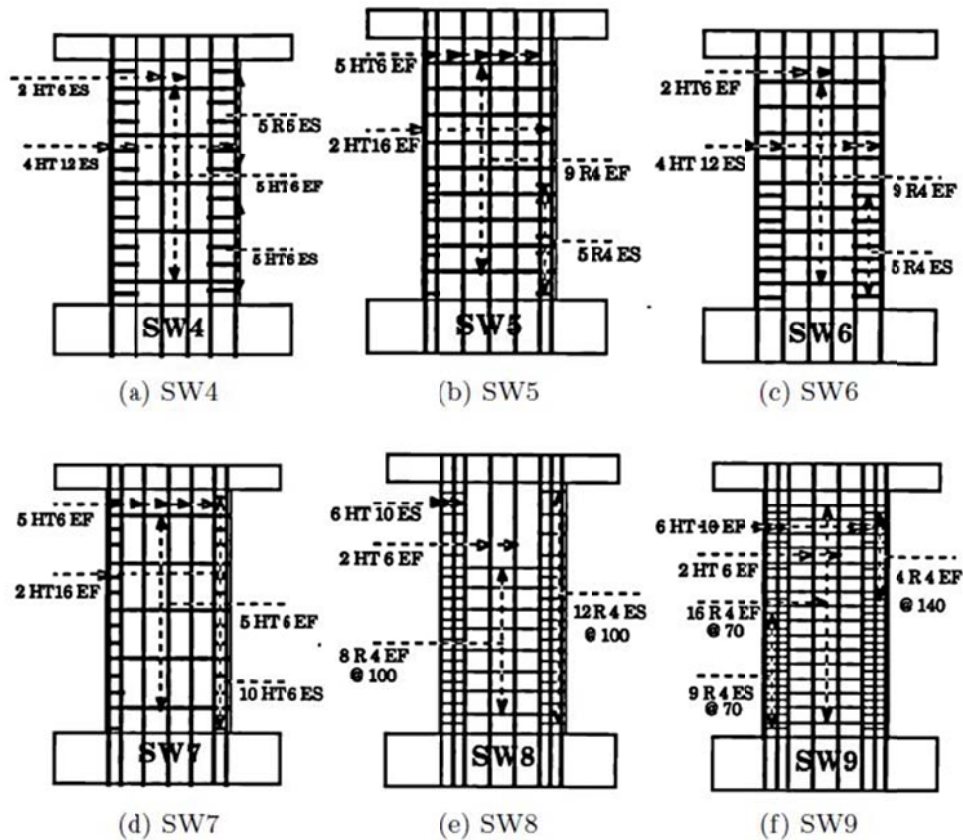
Reinforcement details of Pilakoutas and Elnashai (1995)
